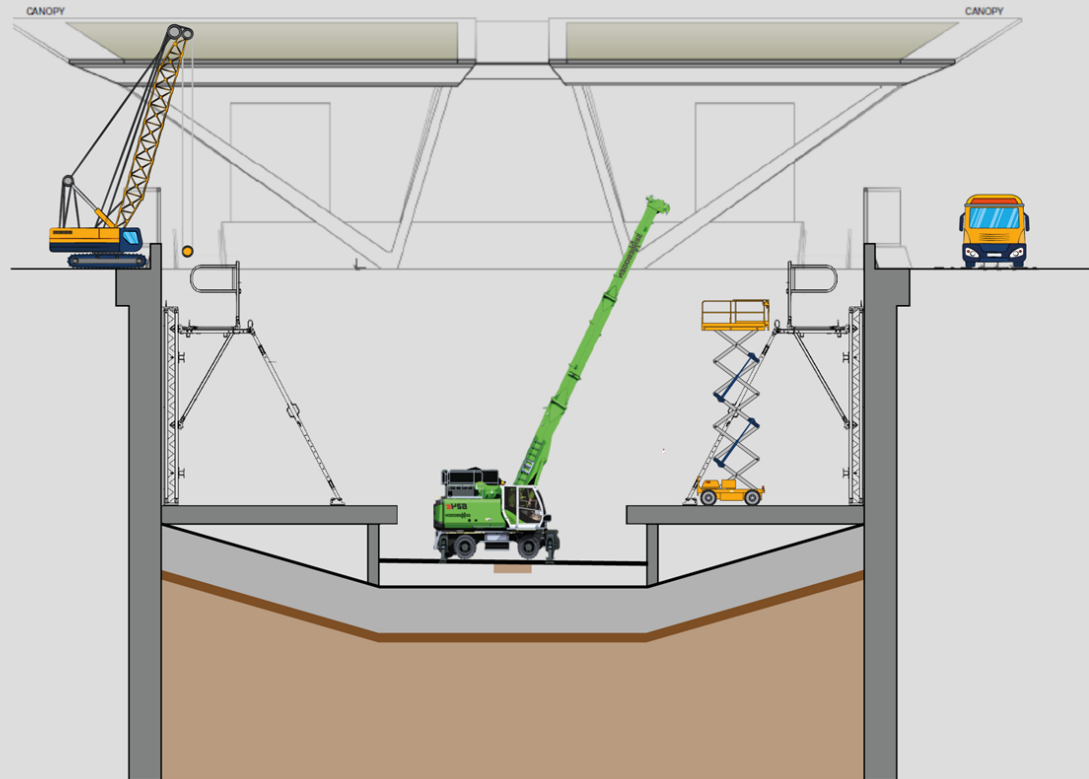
Fosterstown Station Stage 3C - Box Excavation
